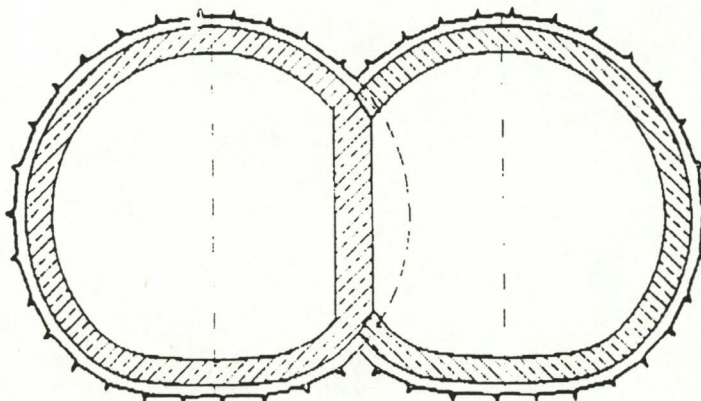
Touching linings / inner lining in first tunnel completed when second tunnel is built
